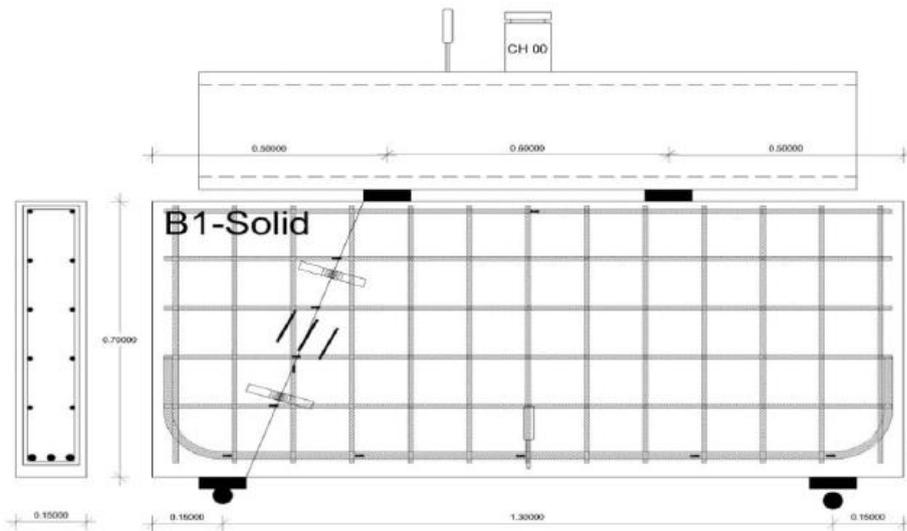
Geometry, Loading, and Reinforcement of Beam (B1) Tested in laboratory
